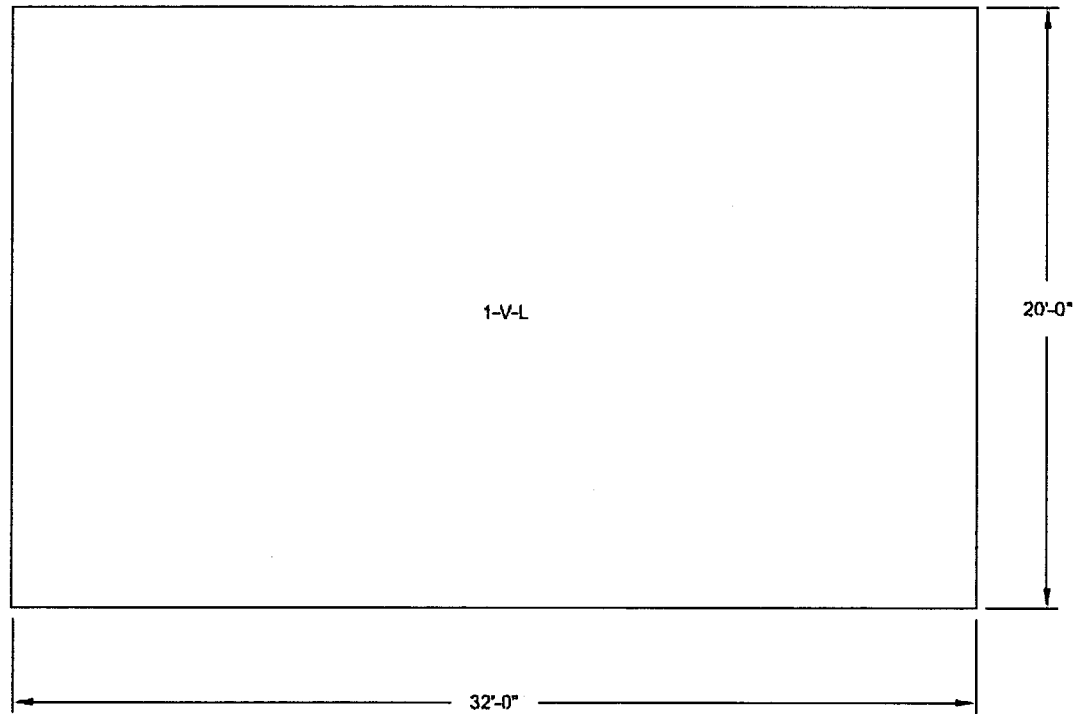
H.6-199 ~~Wall 14 Looking From Outside Transverse Reinforcement Zones Not Used~~
